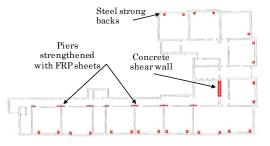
Floor plan of Shirley Community centre showing retrofit
